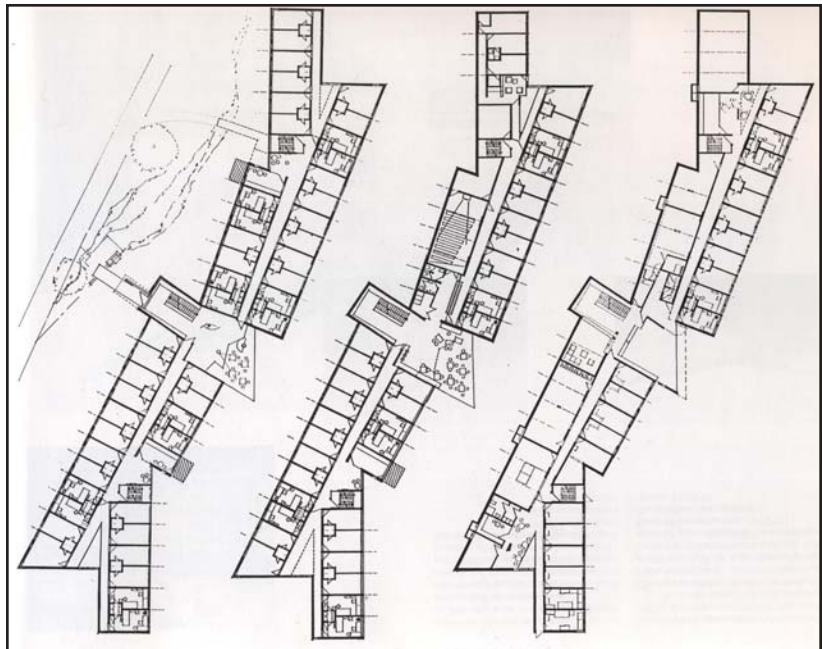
Plans of 1st, 2nd, and 3rd floors.
